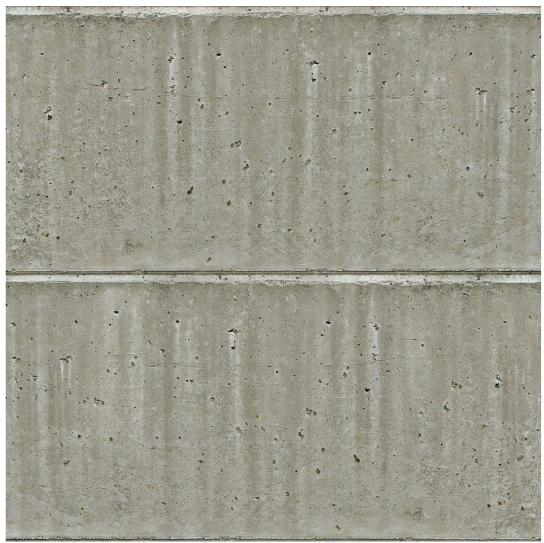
Efflorescence on Concrete Surface. http://www.docfoc.com/concrete-cast-in-place-flat-grey-efflorescence
